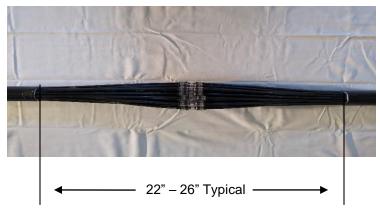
All-in-a-Row Tube Coupling Arrangement for 24-Tube Cable Example
